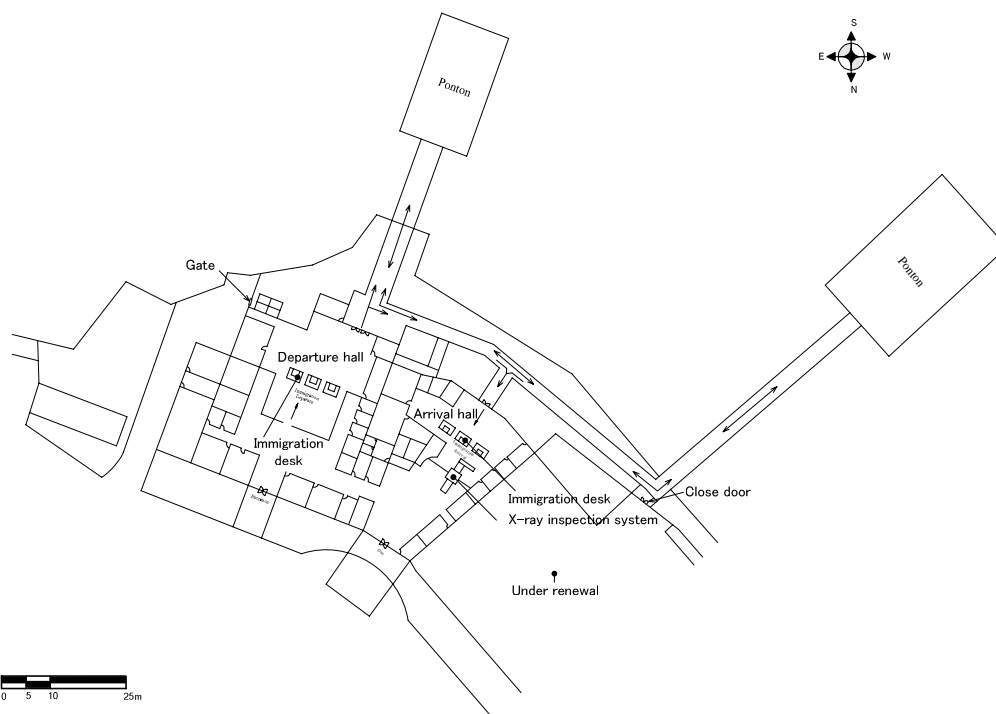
Layout Plan (Passenger Terminal)
